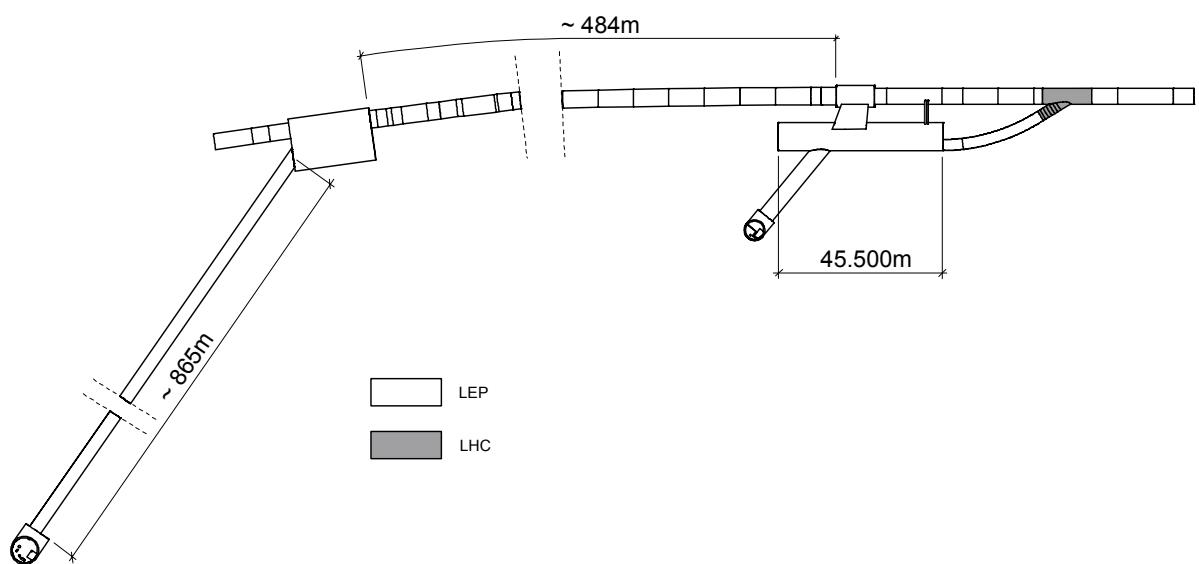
Point 3.2 and Point 3.3 underground layout
